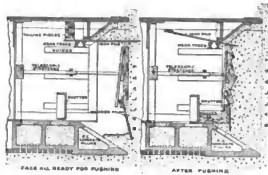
SKETCH SHOWING METHOD OF ADVANCING SHIELD.
